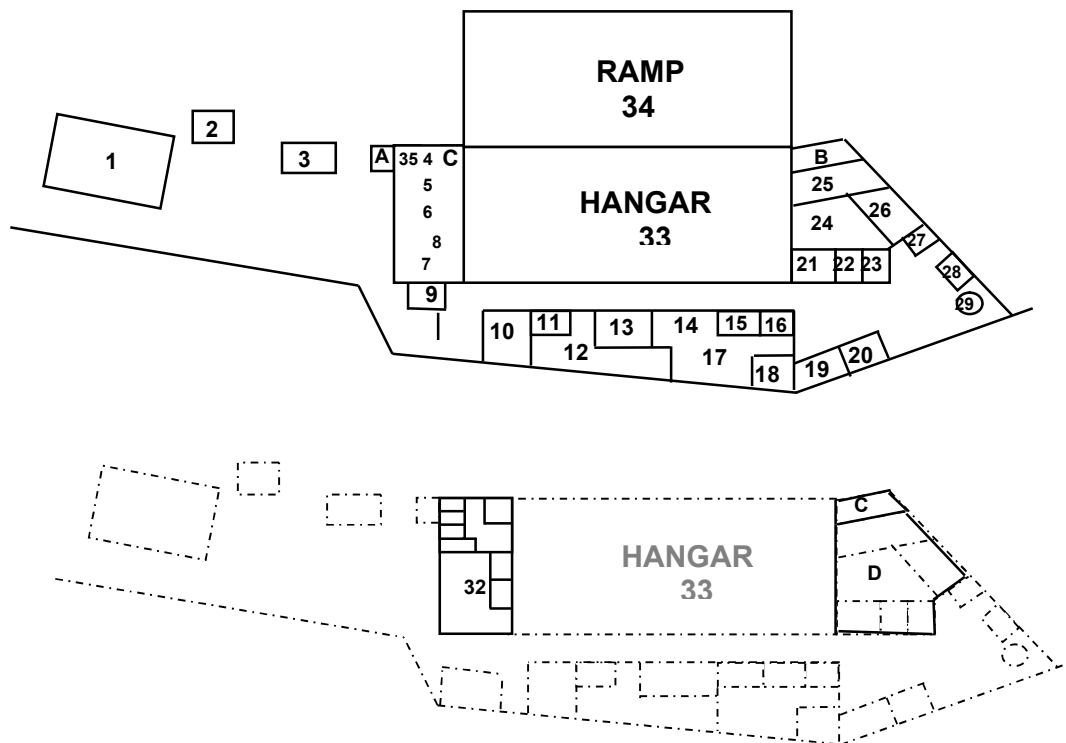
PADC Hangar #3 – Floor Plan (2nd Floor)
